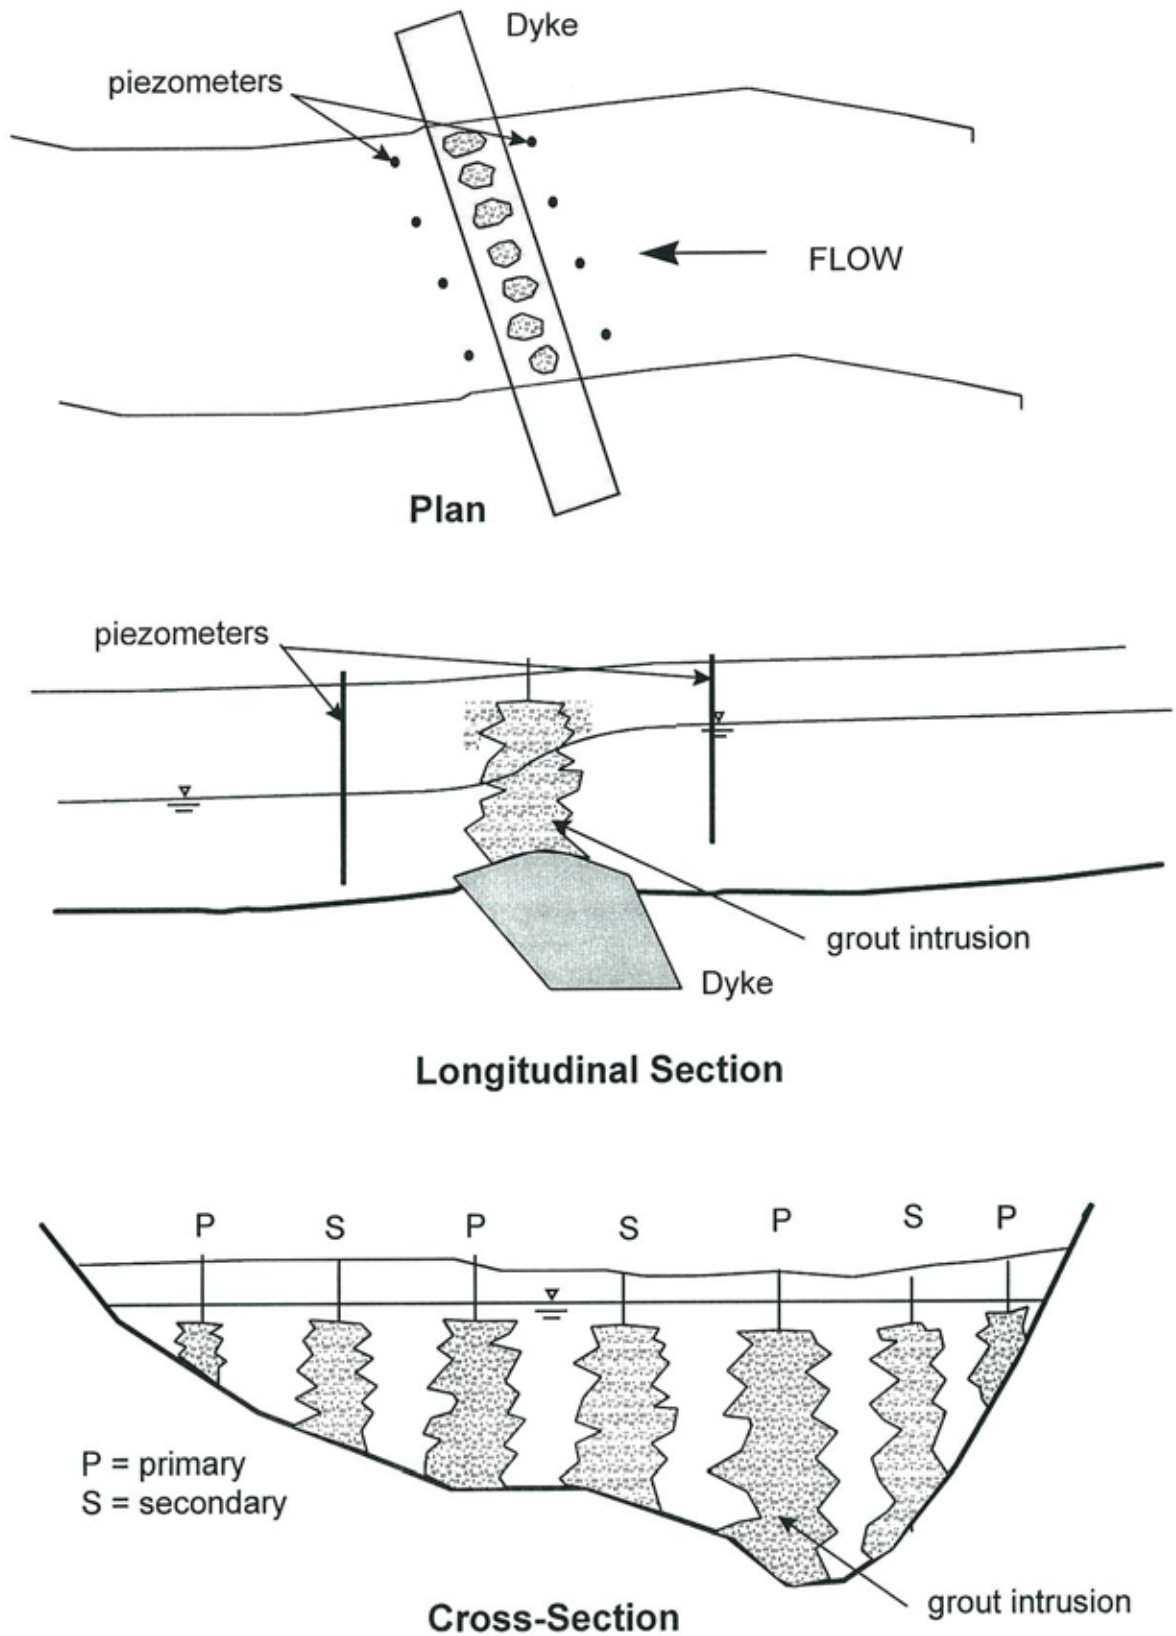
PROPOSED PLAN AND SECTIONS THROUGH RETARDERS
